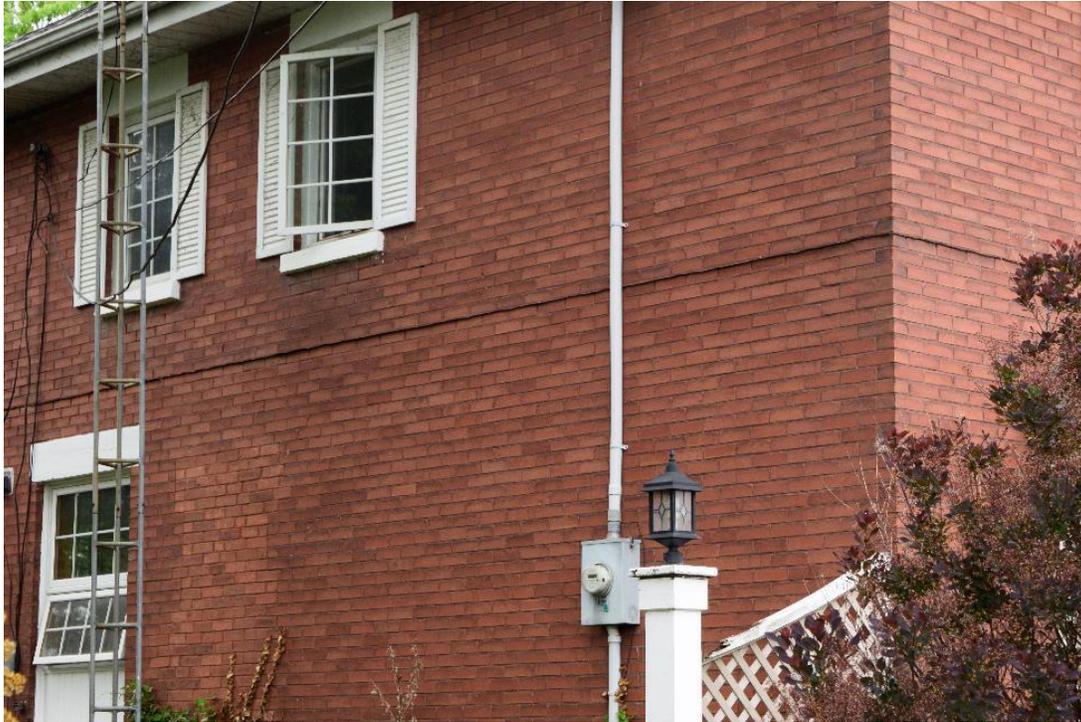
Evidence of foundation settling as observe on northwest corner of structure.
